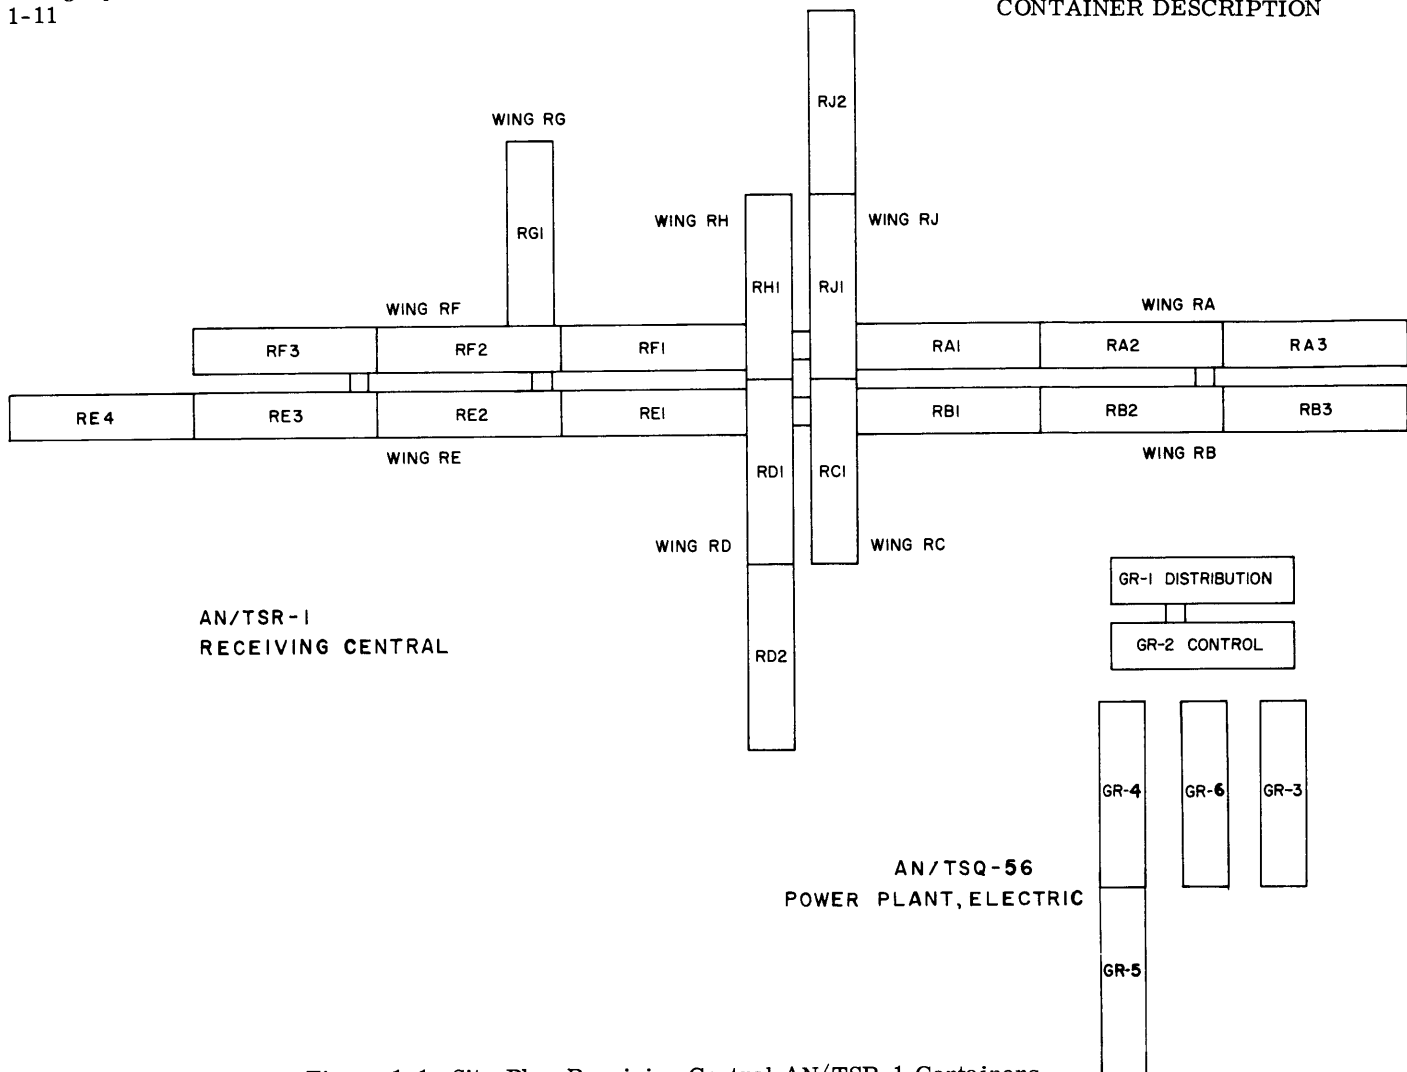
Site Plan Receiving Central AN/TSR-1 Containers
